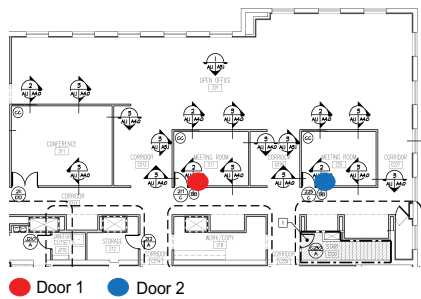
Floor plan showing the installed sensors on two doors of two different rooms.
